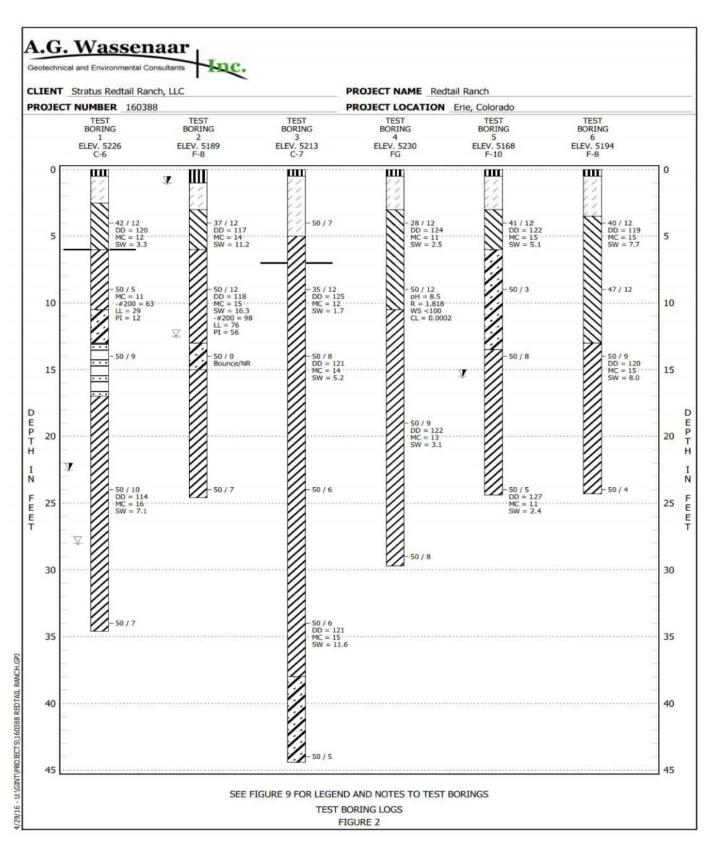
Wassenaar Test Boring Logs 1-6
